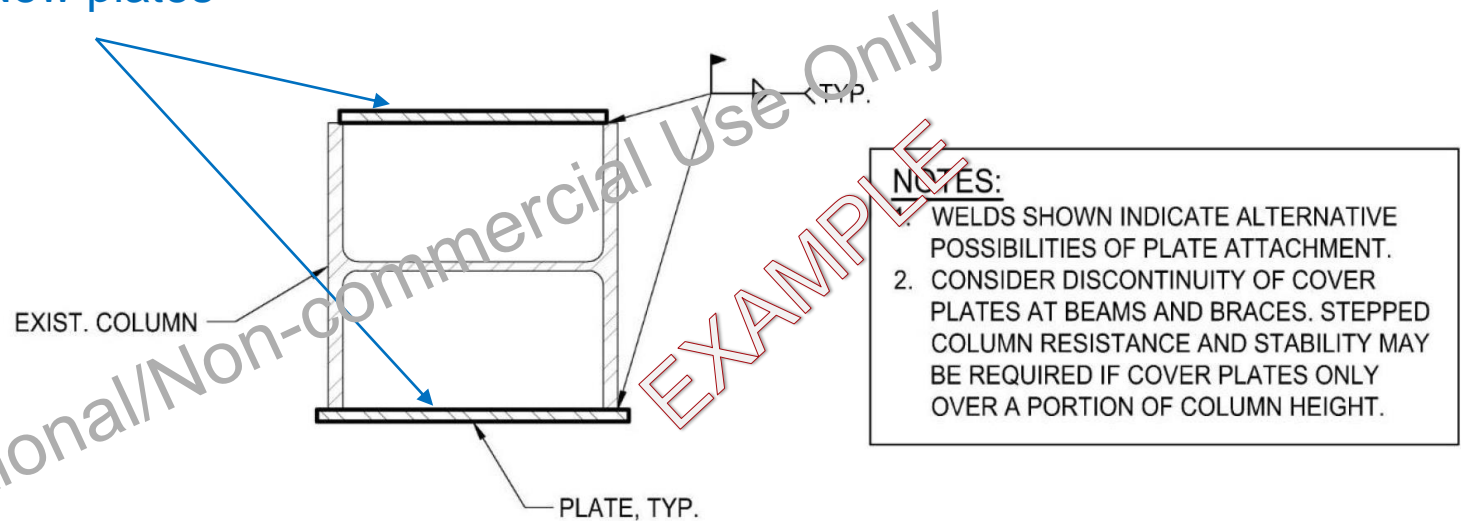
Addition of plates to sides of existing steel W-section column (plan view)
